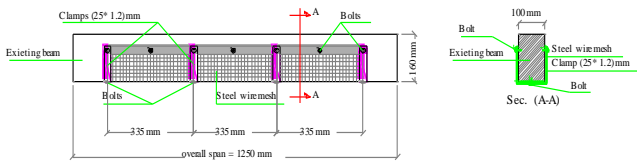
b) Fixing steel wire mesh plies with 4 clamps and bolts
